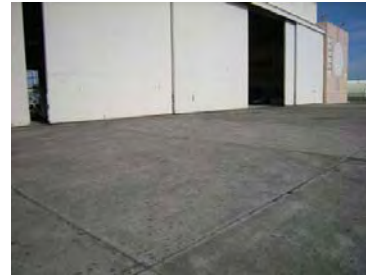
Damaged Area "a." Photo taken looking north, toward Hangar 1.
